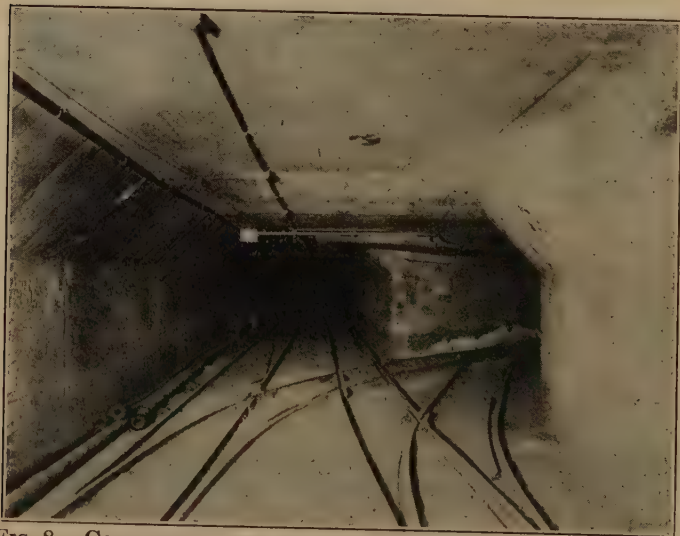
CONCRETED HAULAGEWAY, BATTERED (KNEE ARCH) DESIGN.
